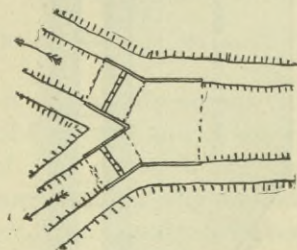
PLAN OF BIFURCATION, DEL NORTE CANAL.
